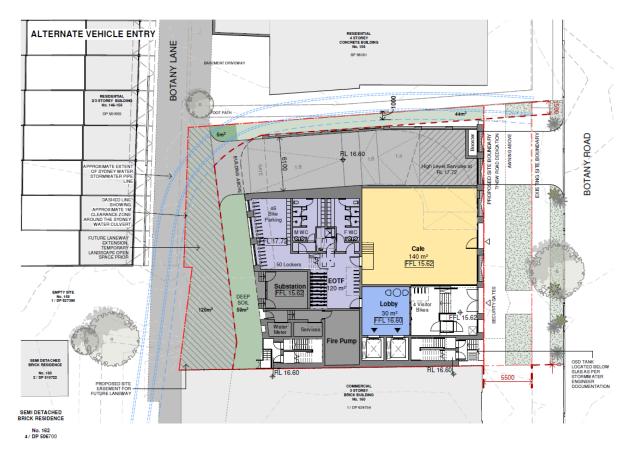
Reference scheme - ground floor plan showing indicative future vehicle entry arrangement
